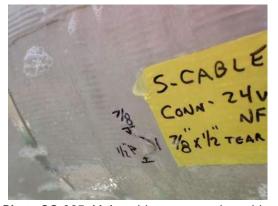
Main cable at suspender cable 24, gouge in cable, leak, west end, north face
